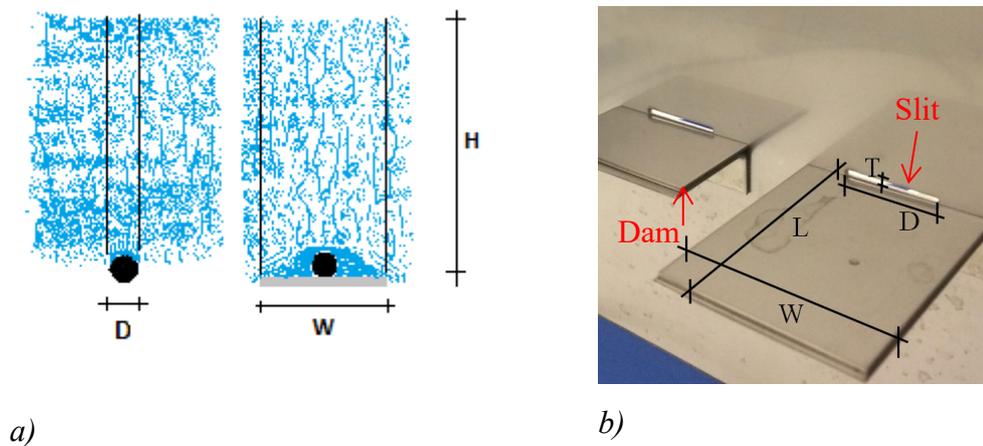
(a) Catch area as regards hole width (D) or dam width (W) plus façade height (H). The assumed catch area is shown within the two vertical lines. (b) The figure shows a vertical stainless steel sheet with several horizontal stainless steel dams located underneath of defects consisting of horizontal slits. Further descriptions of dimensions are given with notations such as protrusion length (L) and height (T) of slits, as used in Chapter 5.
